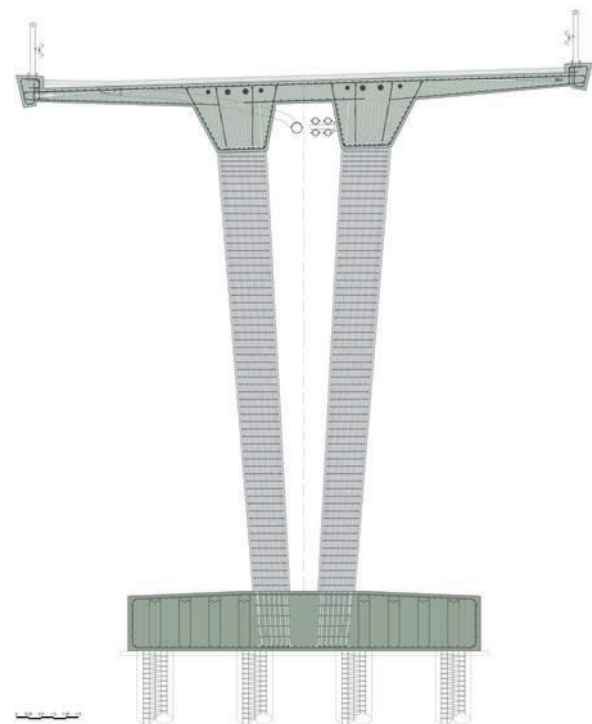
Transversal cross-section of the deck, the pier and the foundation
